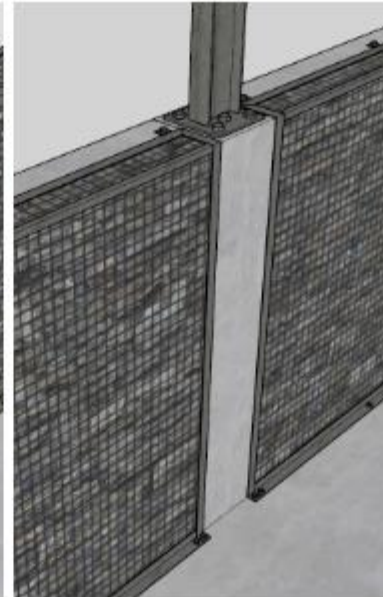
3D model of retaining gabion walls used (2nd option)
